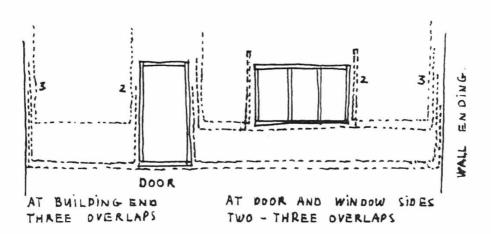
RECOMMENDED REINFORCEMENT PATTERN FOR SHEAR WALL SECTIONS
